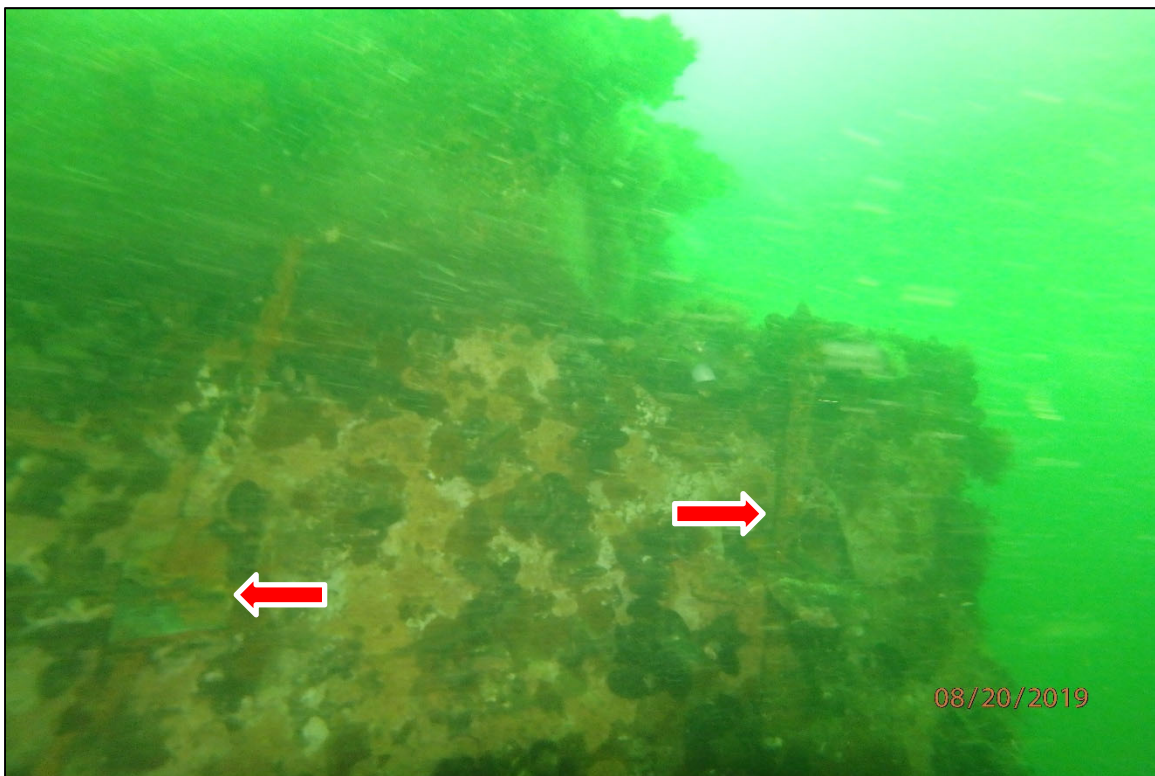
Typical Failed Anchor Bolts and Brackets W1 and W2 on Cleanout Chamber at the Southwest Corner (Looking Southeast).
